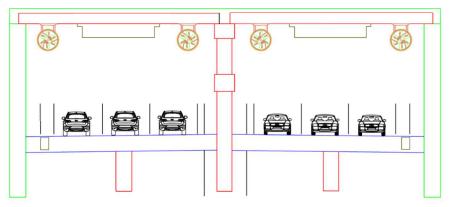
Tunnel cross-section of the Cut & Cover section [2]
